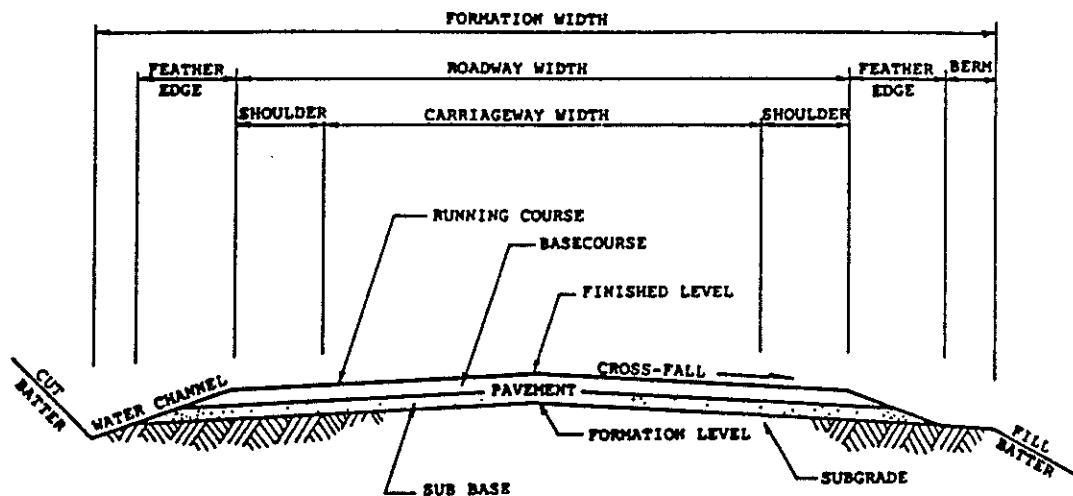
Typical unsealed pavement profile (Ferry 1986b).
